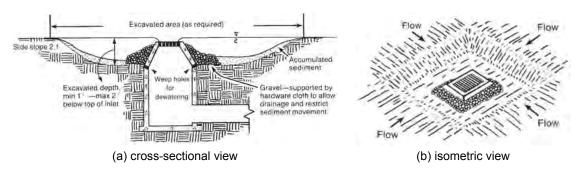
Typical Details of Excavated Drop Inlet Protection (NC-DENR 2013).
